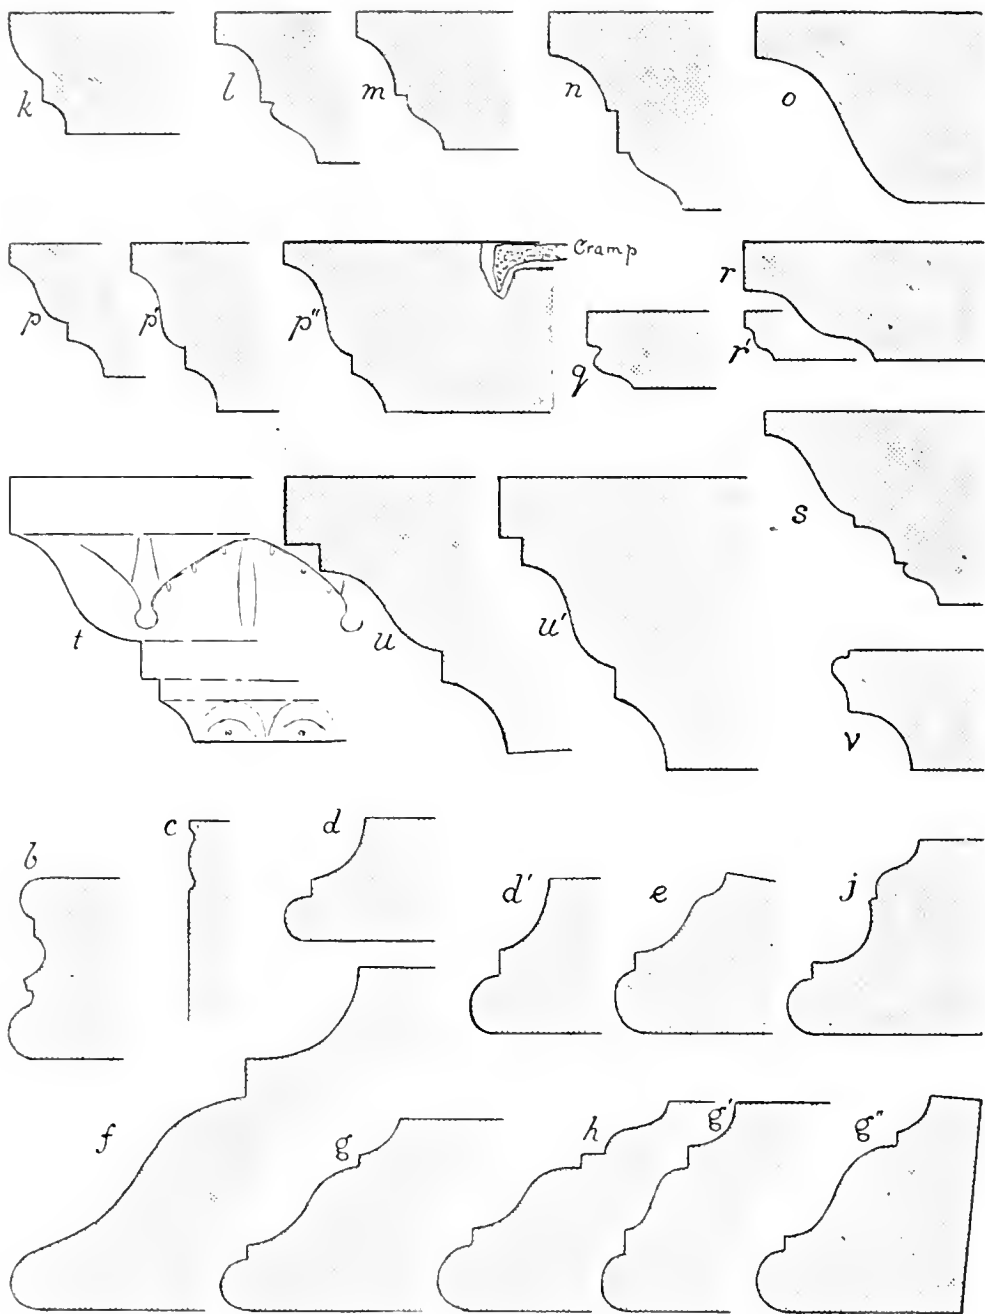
SECTIONS OF MOULDINGS. Half size. *k-v*. CORNICE MOULDINGS. *b-g''*. BASE MOULDINGS.
